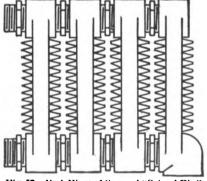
End View of Several "School Pin" Radiator Sections Connected Together.
